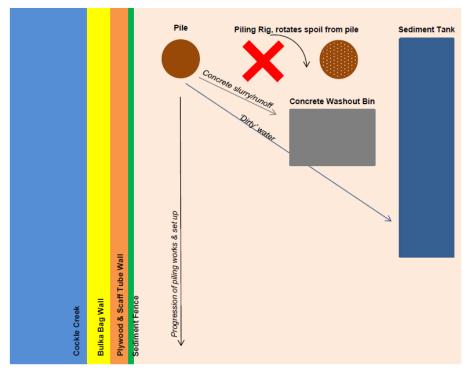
Typical piling set up along the plywood fencing of Cockle Creek (construction of retaining wall 2, the closest set up to Cockle Creek). Note the sediment fence was replaced with concrete backfill to ensure no spillage to seep through to the creek
